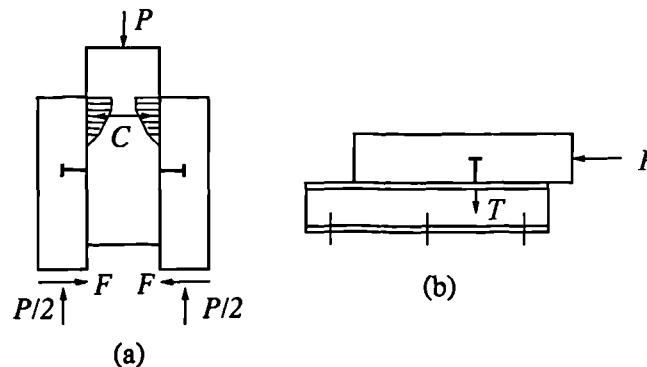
(a) Standard test arrangement; (b) Slutter and Fisher's specimen.
